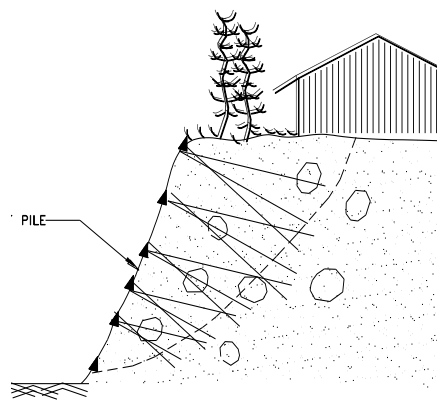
TIMBER PILING FOR SLOPE STABILIZATION
